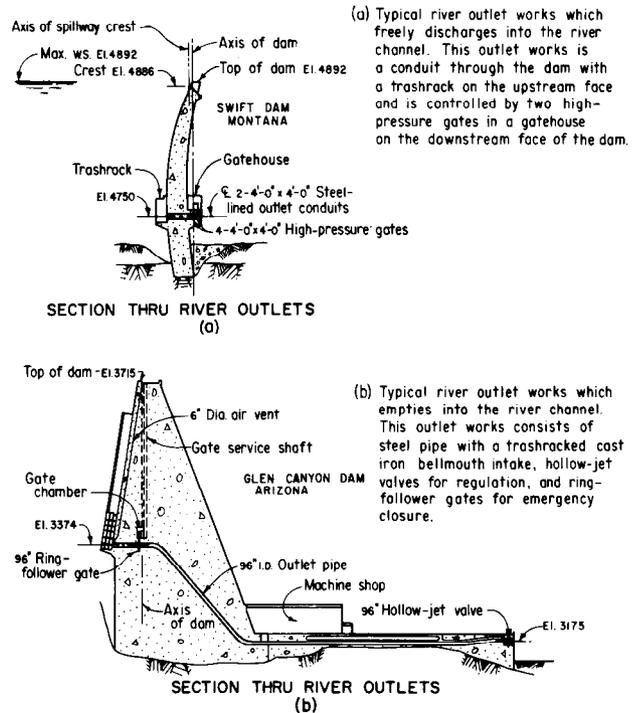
Typical river outlet works without a stilling basin. —288-D-3059
